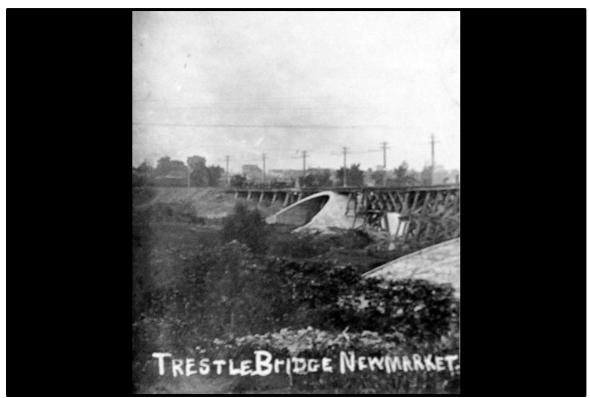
Trestle bridge with arch (Adapted from Dodge 2009)
